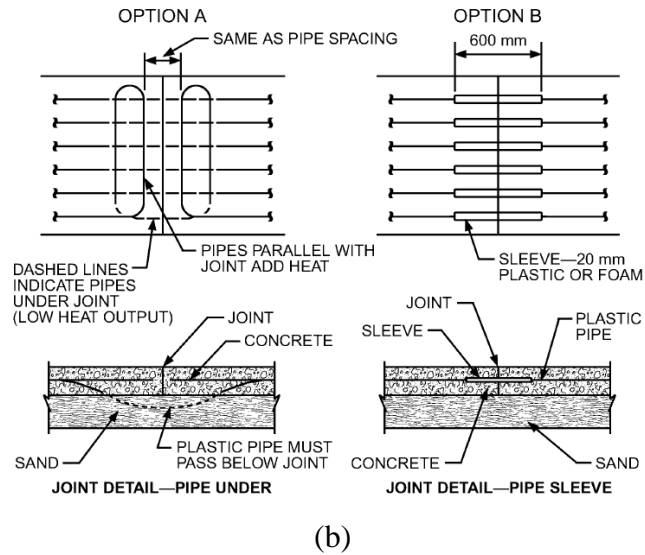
HHPS using 2LCP: (a) place pipes and top layer (concrete layer) and (b) pipe details for concrete construction (ASHRAE 2015)
